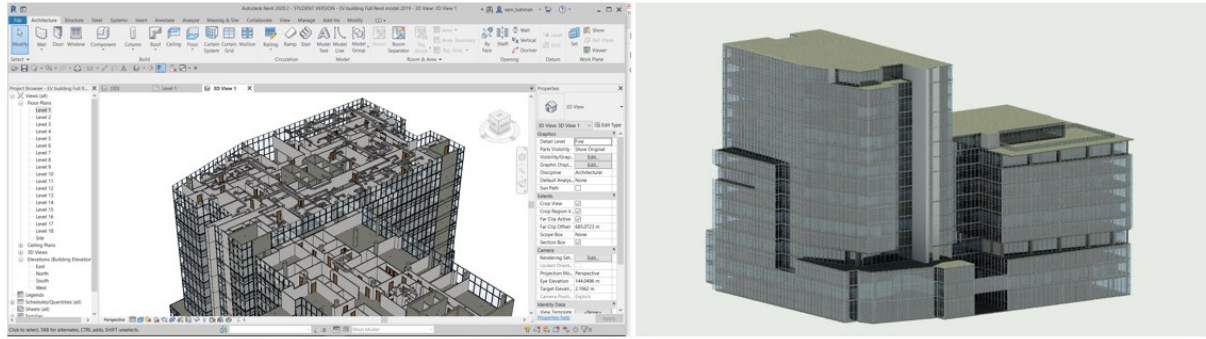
An overview of the 3D model of EV building developed in Autodesk Revit
